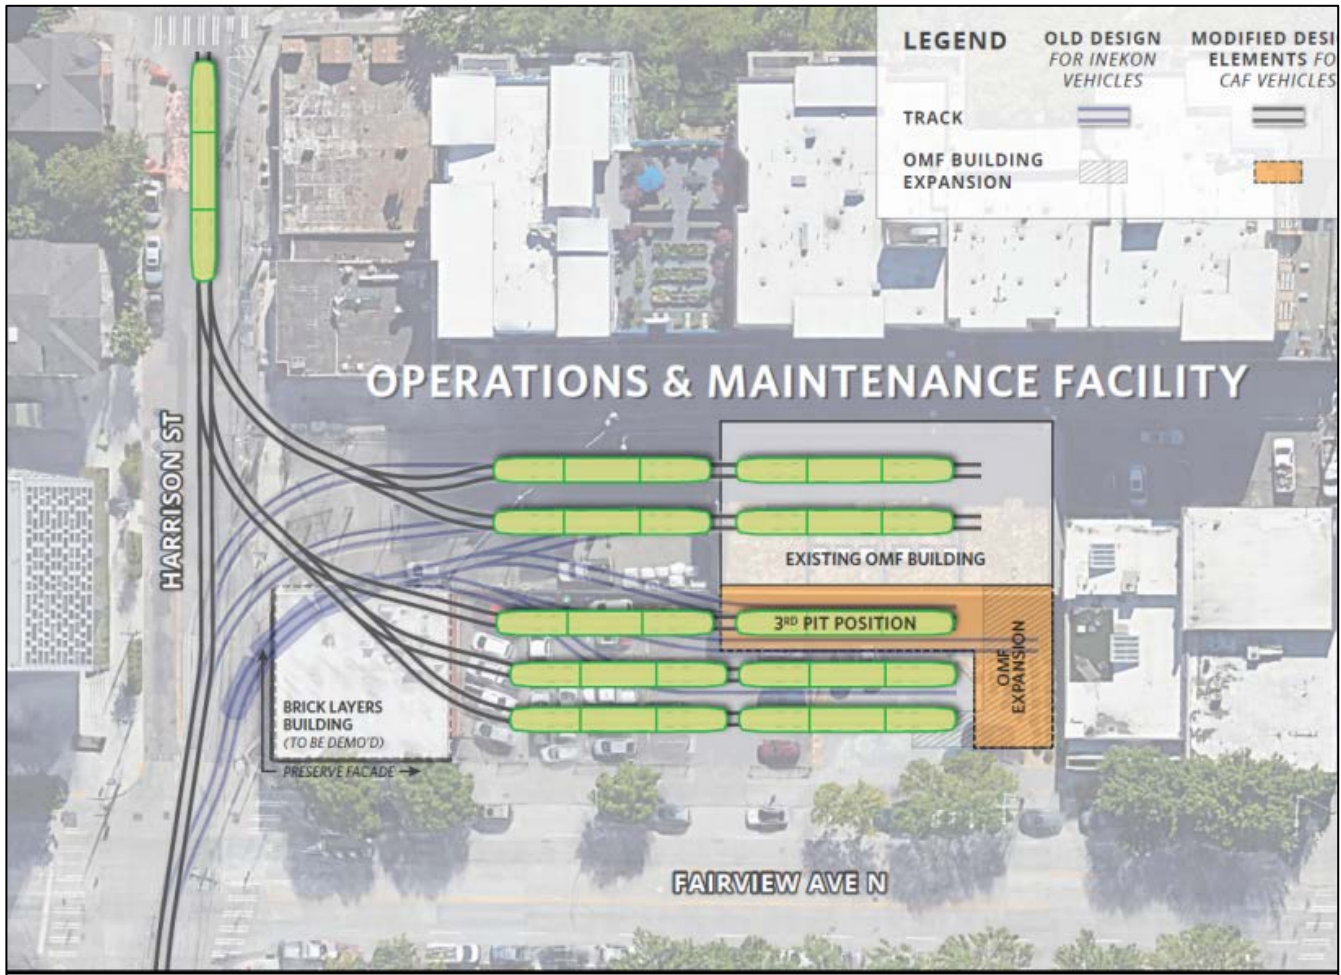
Conceptual layout of track and OMF expansion at SLU OMF site.
